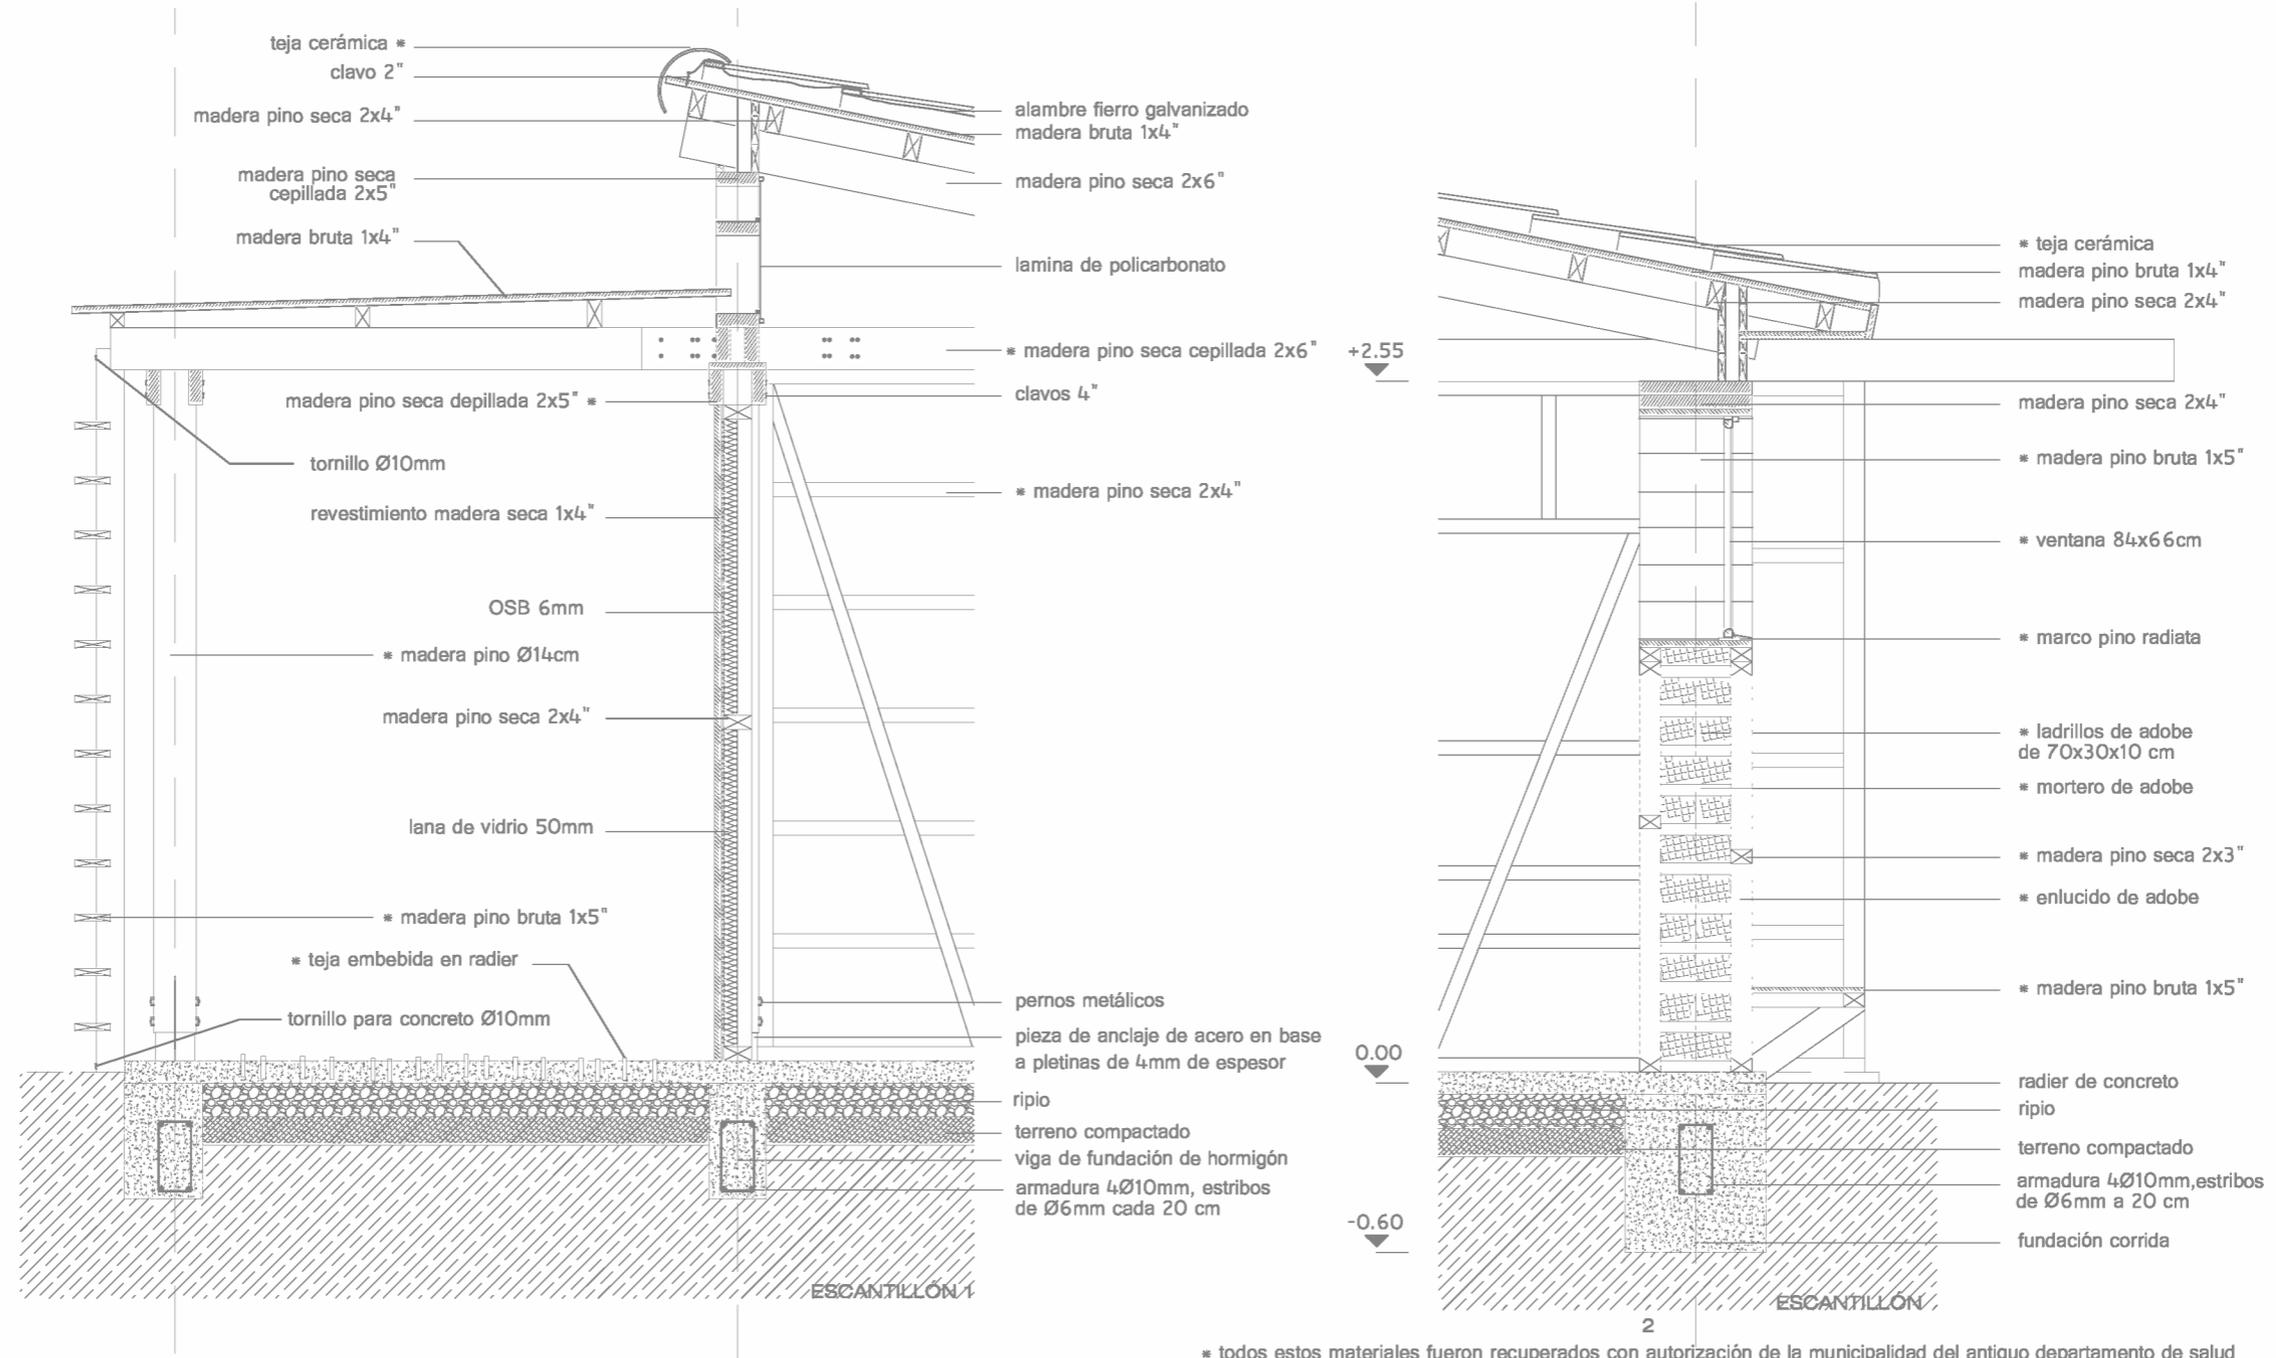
Constructive Sections (drawing by Óscar Natividad)
